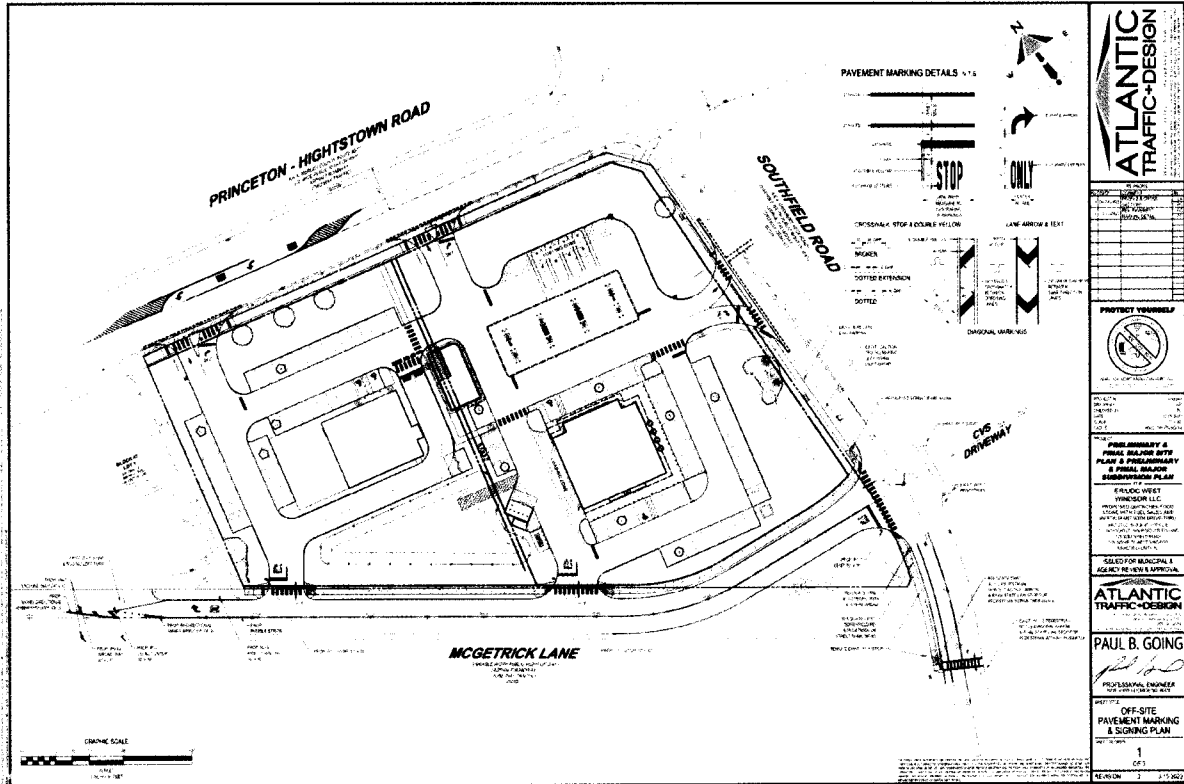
McGetrick Lane Layout Plan by Atlantic Traffic and Design Engineering, LLC
